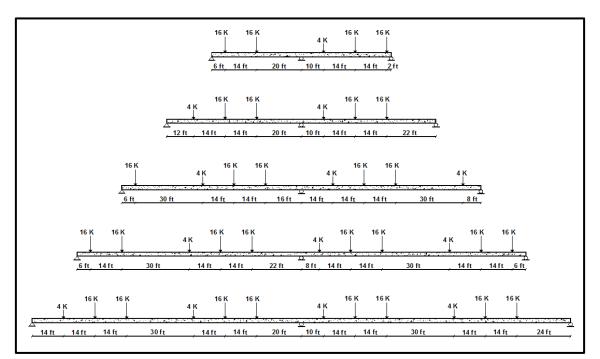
Longitudinal Beam Section of a Two-Equal-Spans Bridge and Critical Position of HS20 Trucks That Produce the Maximum Negative Moment at Interior Support for the Five Different Span Lengths
